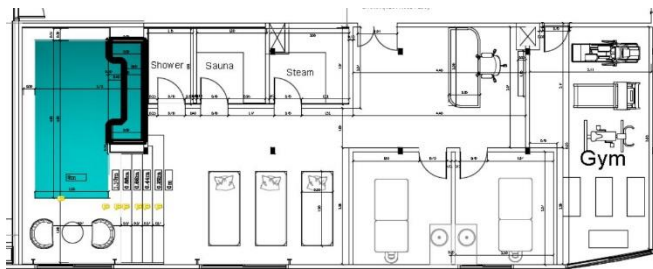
, Soleil Nile Cruise Spa plan (After renovation) (Khalifa Architects, 2023)
